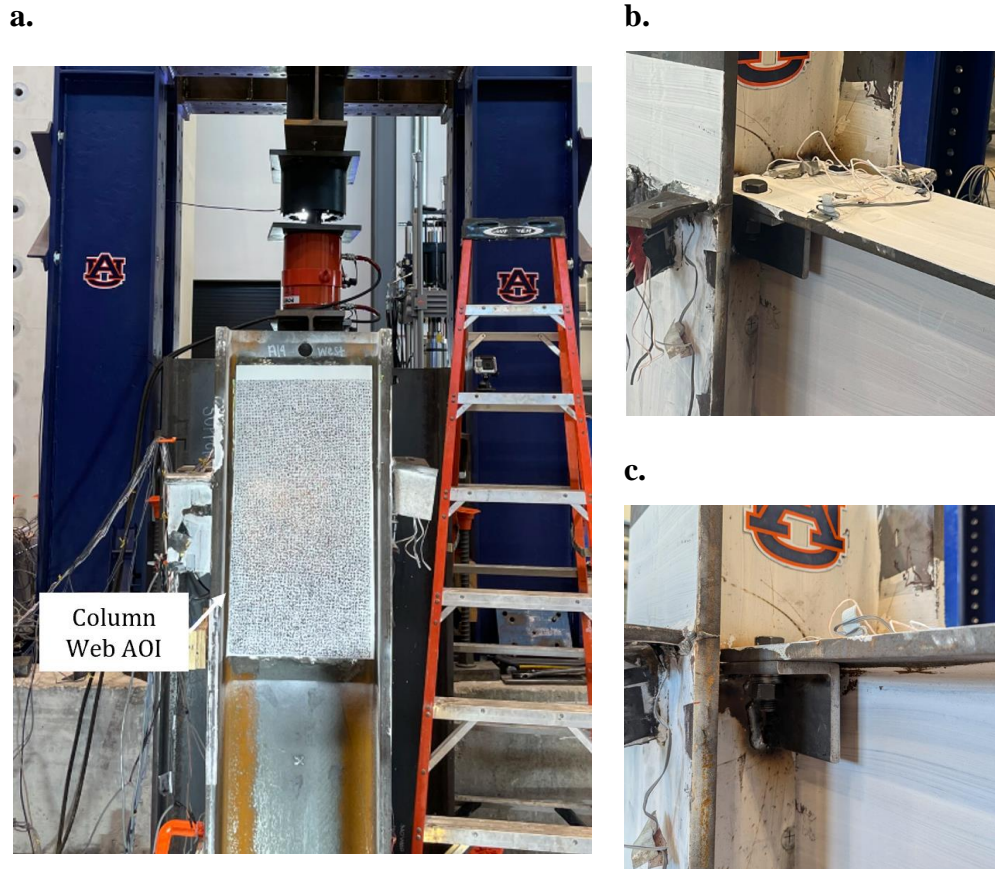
Connection L (Test 6) Before Testing (a) Column Web, (b) Connection Flange, and (c) Connection Angle
